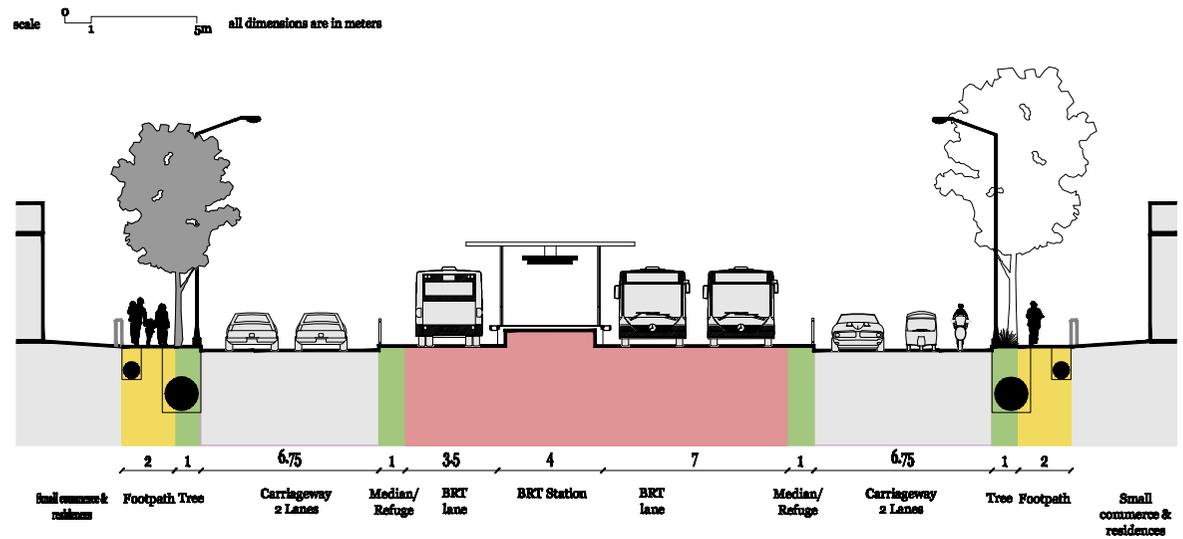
Section through BRT station for typical design for BRT corridors with 36 M ROW
